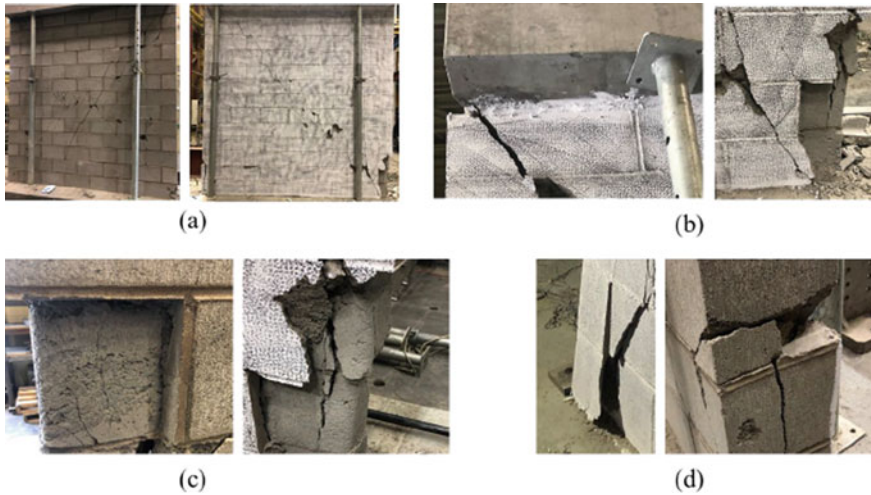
Typical damage observed during the cyclic test: a Stair-stepped and diagonal cracking, b Upper end and toe penetration cracking, c Vertical grout cracking, and d Spalling of face-shell
